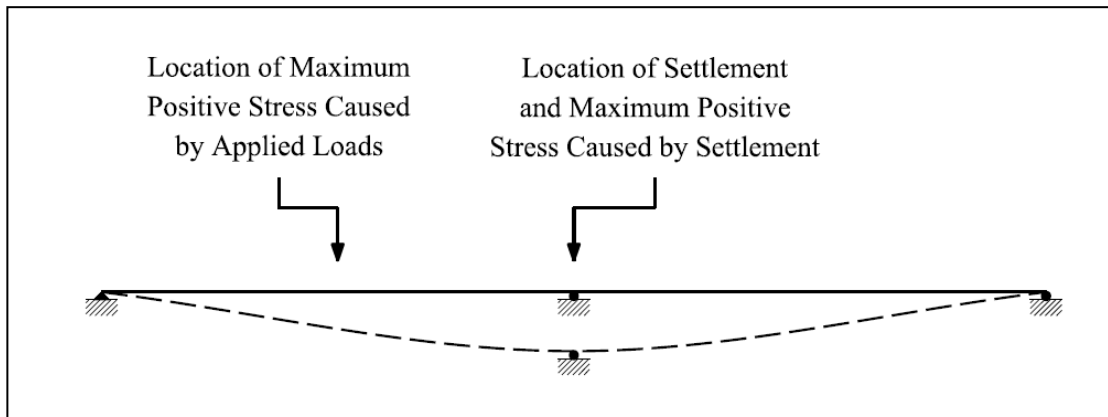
Interior Support Settlement of a Two-Span Continuous Bridge
